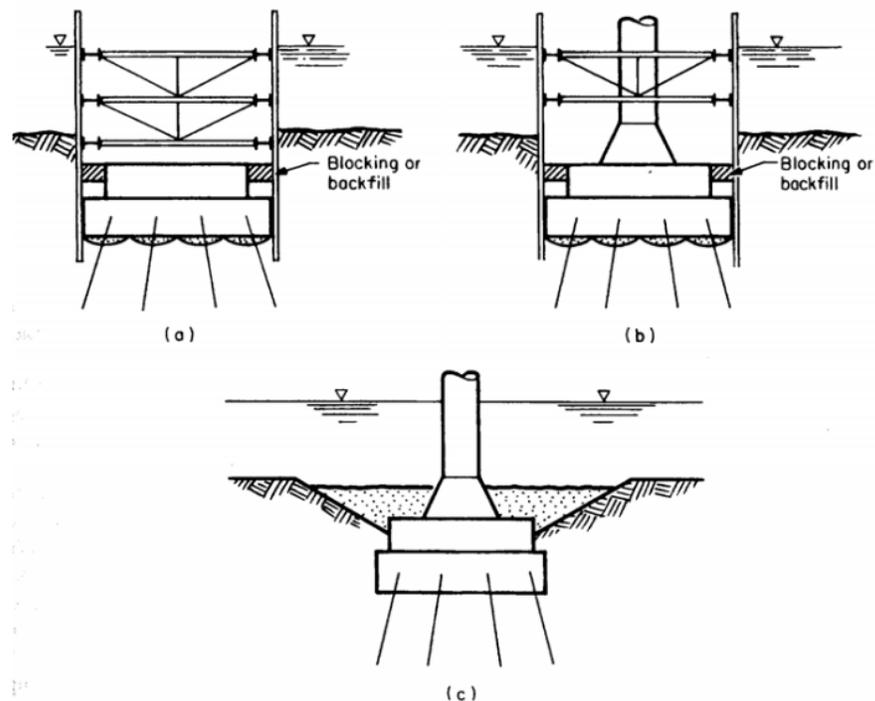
D: Cofferdam construction details. (a). Check blocking, dewater, construct footing block, block between footing and sheet piles. (b) Remove lower bracing, construct pier pedestal, construct pier shaft. (c) Flood cofferdam, pull sheets, remove bracing, backfill. Source: UW Department of Construction Management (2007).
